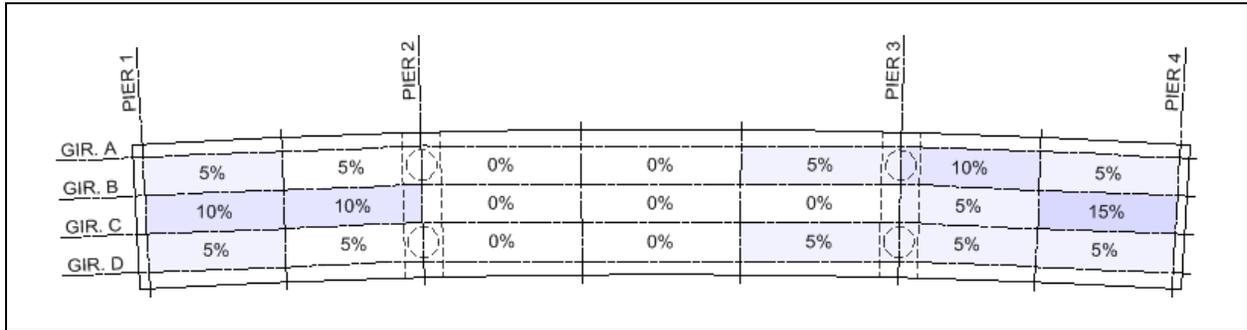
Bridge 6/8 Crack Intensity Diagram
